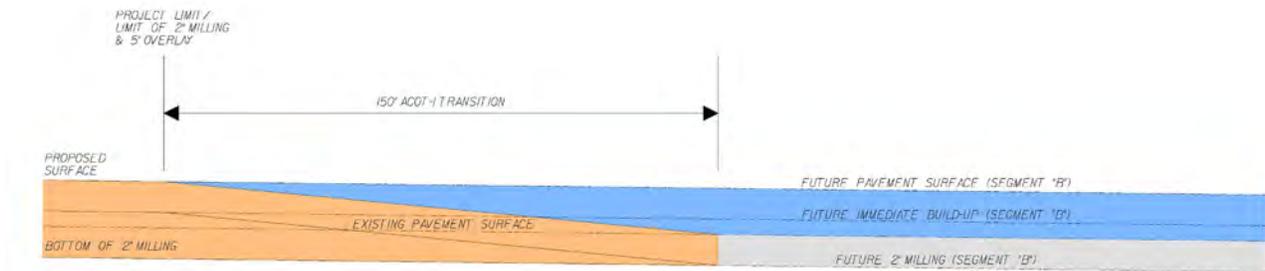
Pavement transition at the future Segment B Project.
